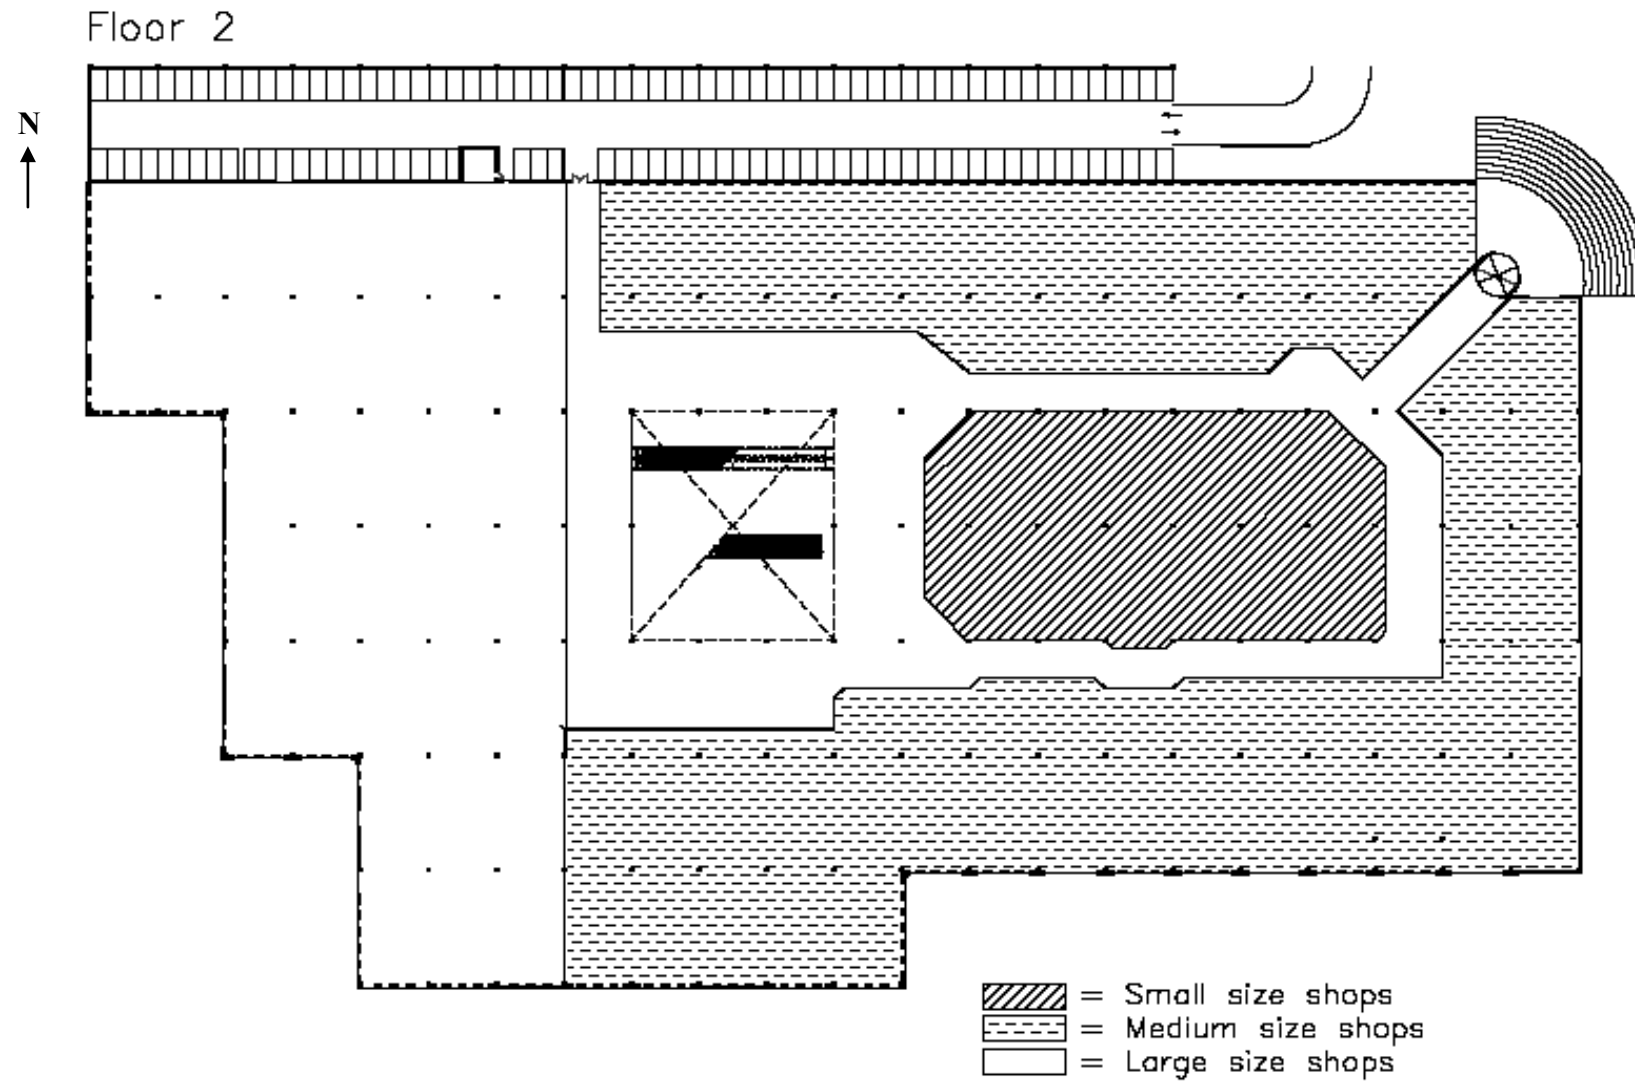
Original Shopping Mall Building Plan – Floor 2
